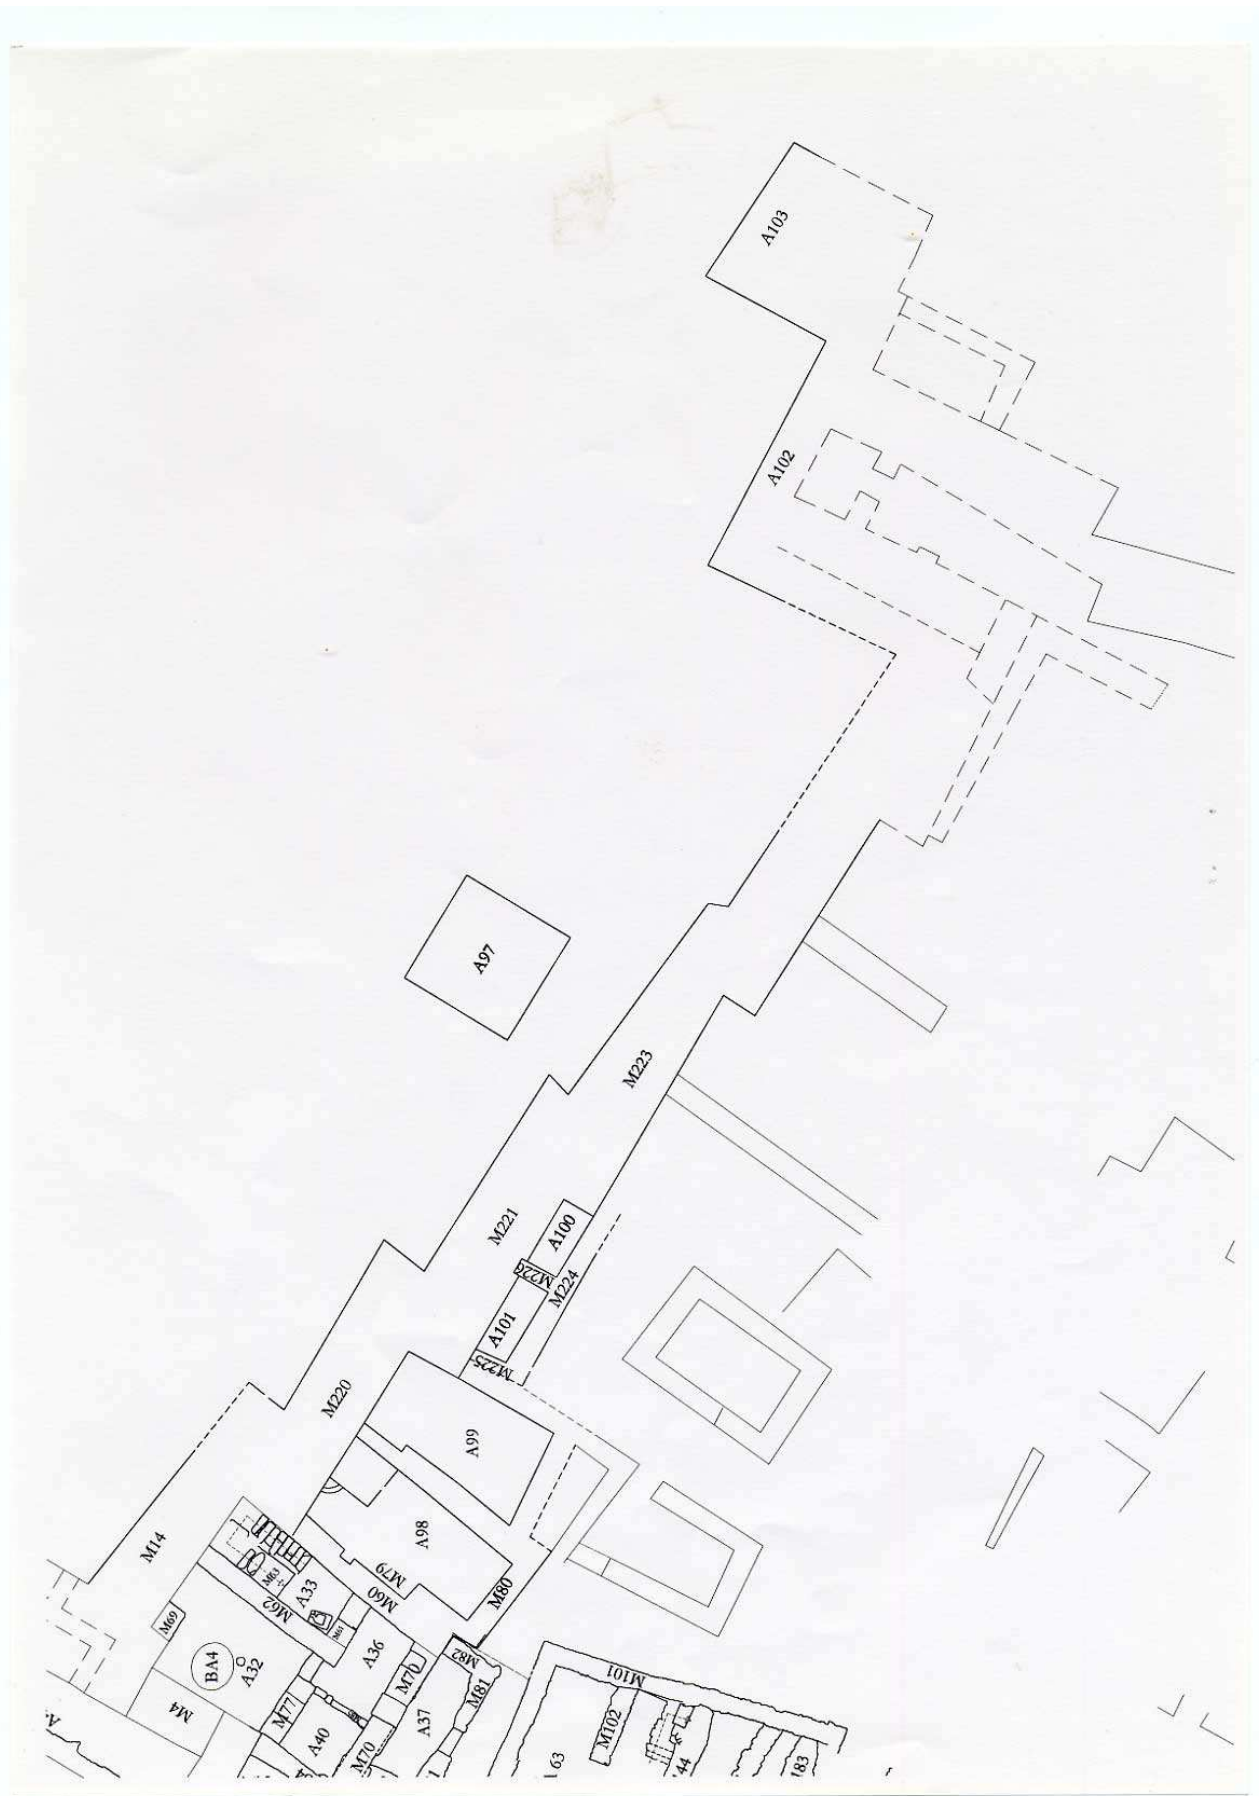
The north-eastern sector of excavated city walls with the tower.
